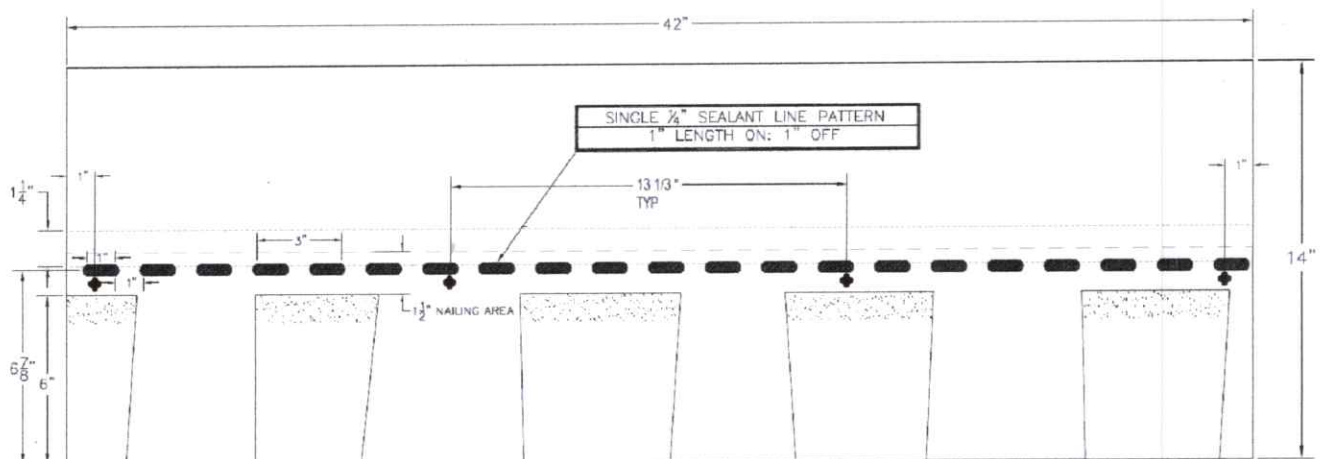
ProLAM™ Architectural Shingle 4 Nail Pattern (non-HVHZ only)
